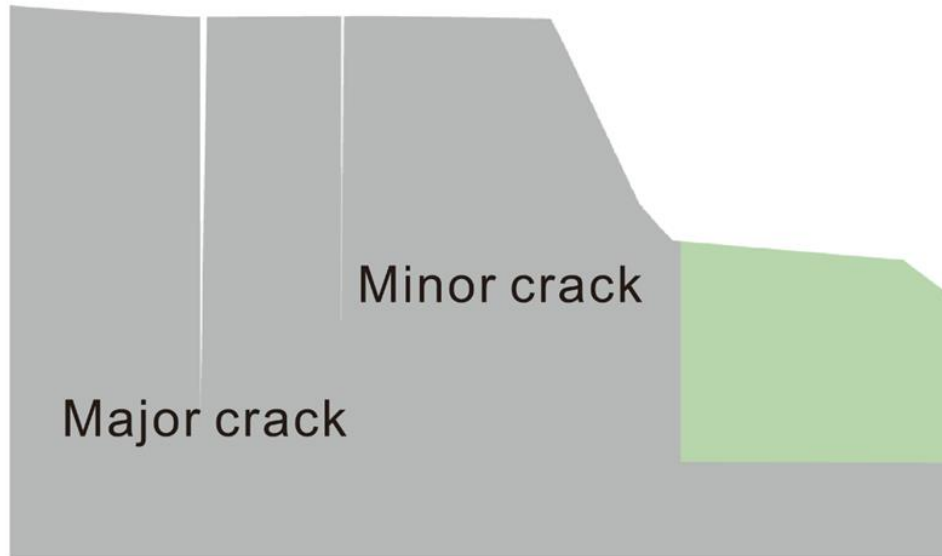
The cross-sectional view of cracks (west to east)
